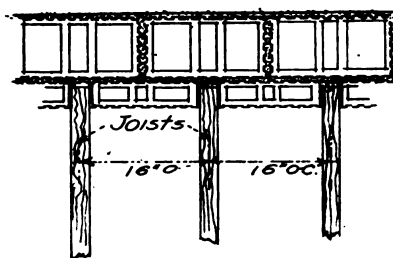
Plan of Joists Framed Into Hollow Tile Wall. Two Sets of Tile Are Used, as Shown
